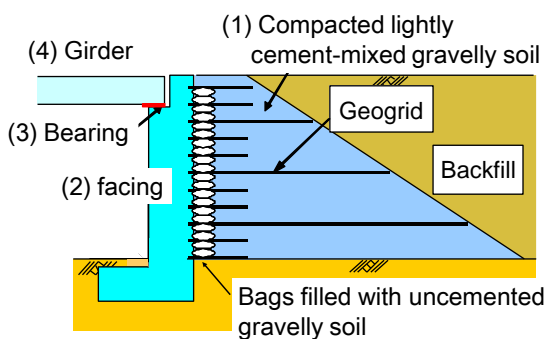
GRS bridge abutment (the numbers denote the construction steps).
